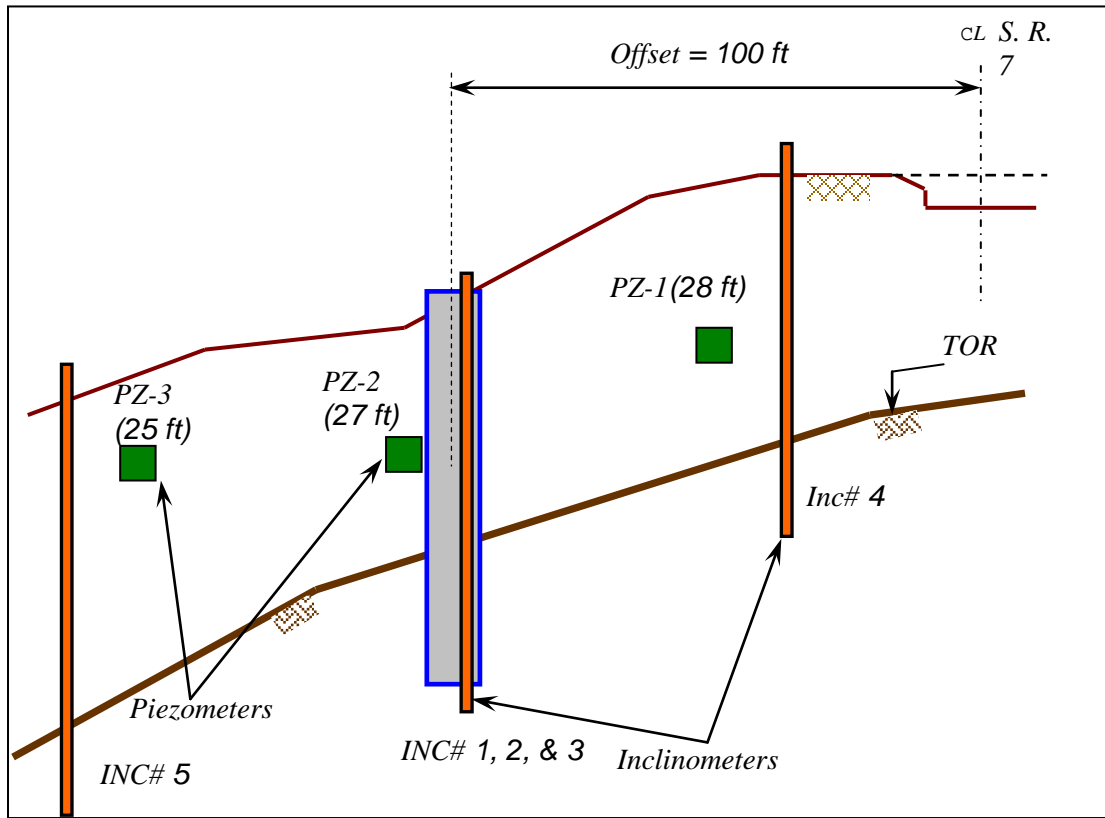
Cross-Section View of WAS-7 Site Showing Instrument Locations
